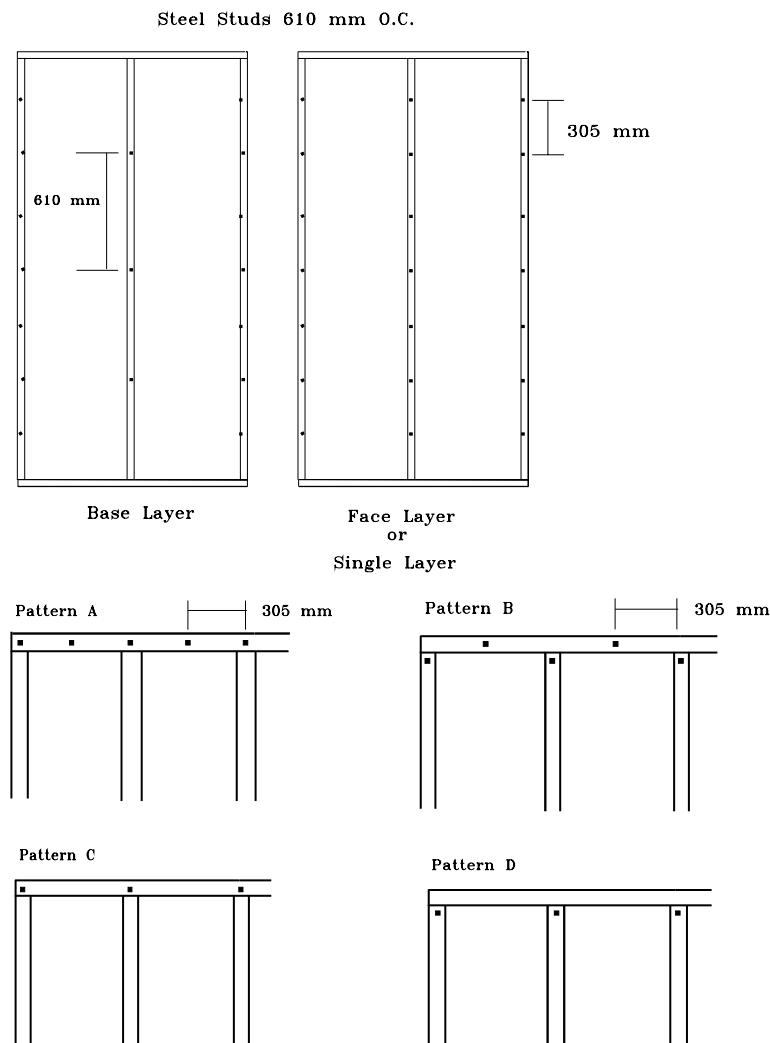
Screw attachment layout for single or double-ply gypsum board attached parallel to non-loadbearing steel studs at 600 mm o.c., single tracks at top and bottom.
